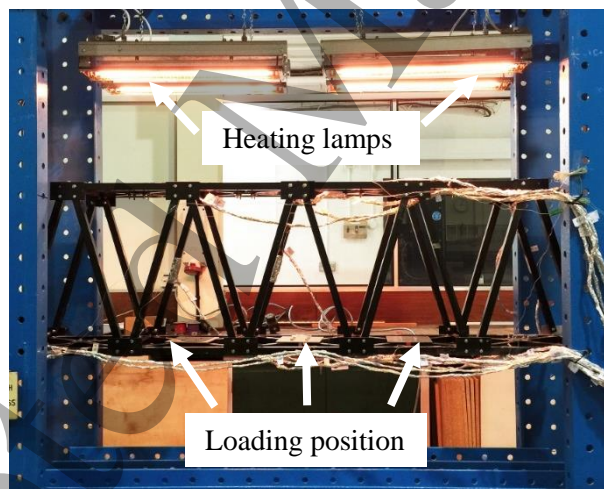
The truss bridge model in Structural Laboratory in University of Warwick
